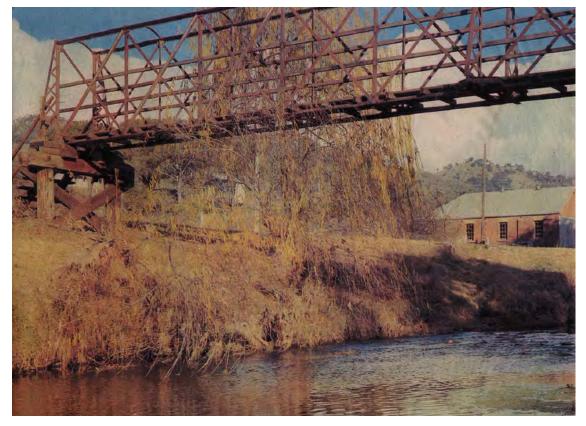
View south-east of the iron footbridge at its original location at Bowling Alley Point, date unknown. (Source: Australia Post 1983)
